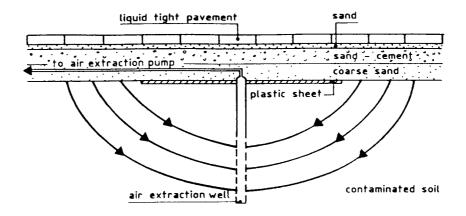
Outlining of the design of air extraction wells under the liquid tight pavement.
